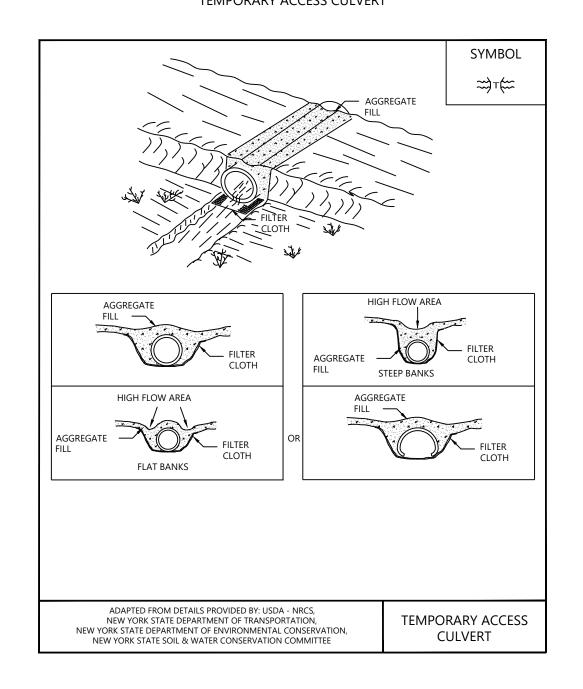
TEMPORARY ACCESS CULVERT
